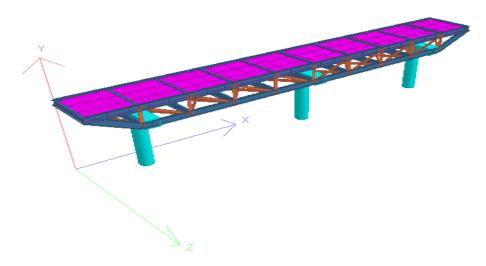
Proposed 3D model for the Over- Truss Bridge. (STAAD pro)
